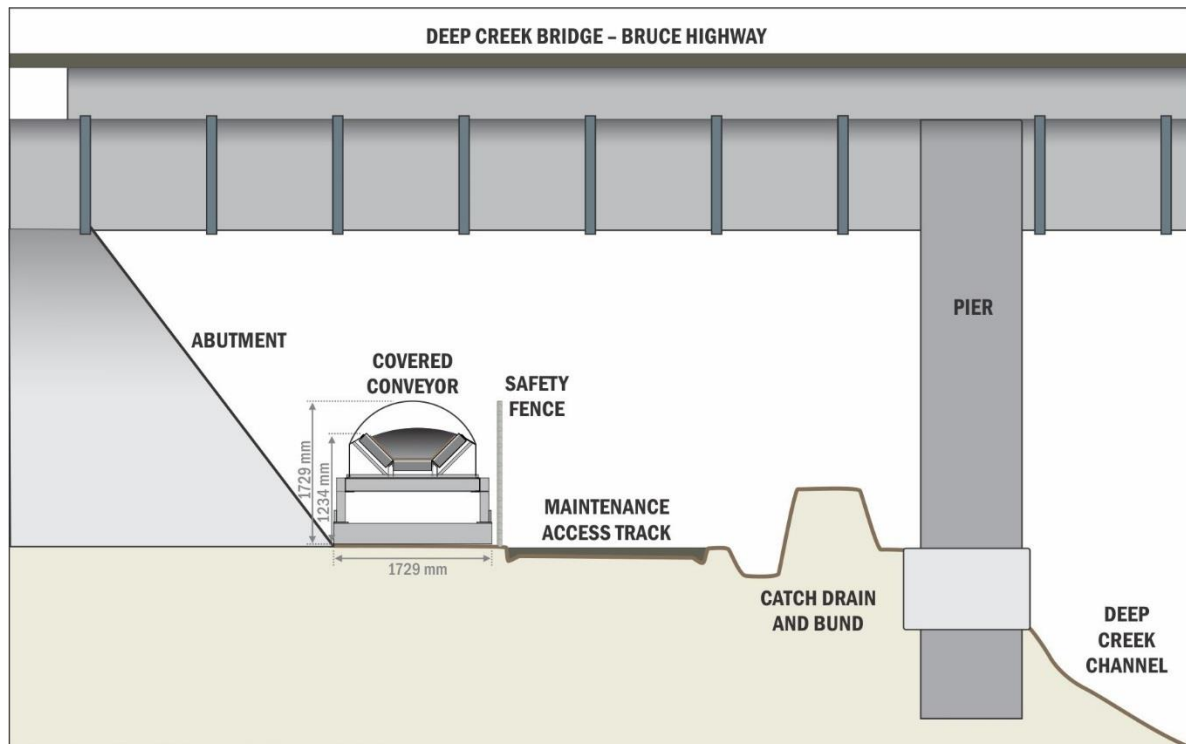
Conveyor crossing under Deep Creek road bridge
